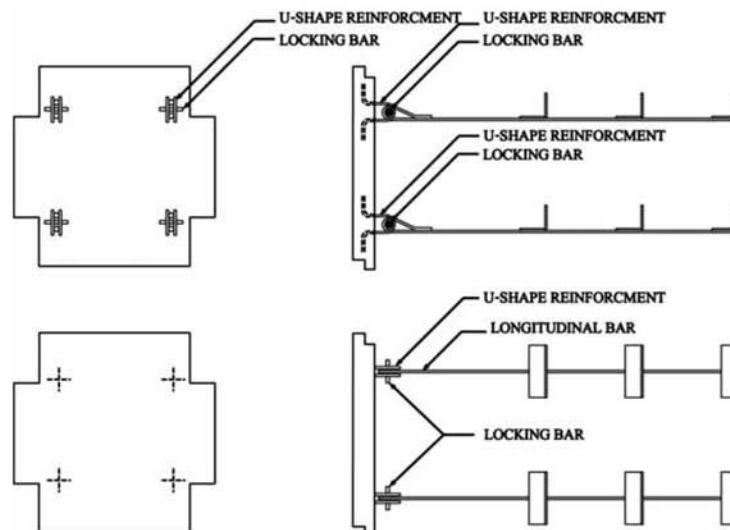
Connection of the bearing reinforcement to wall facing (Horpibulsuk and Niramitkornburee, 2010)
